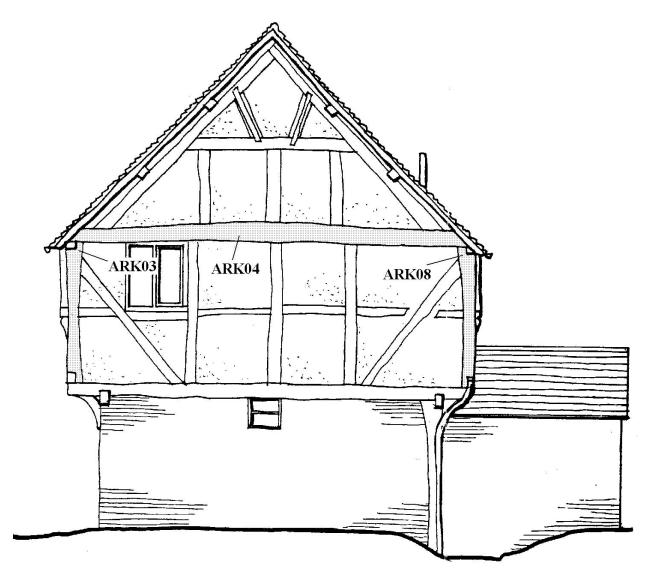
East elevation of Church House, showing timbers sampled for dendrochronology. Adapted from drawings supplied by Anna Deeks
